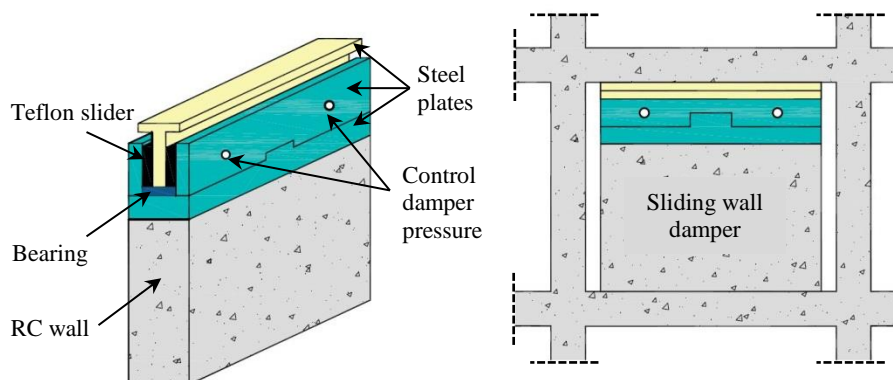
Schematic model of wall friction damper (adopted from Cho and Kwon (2004))
